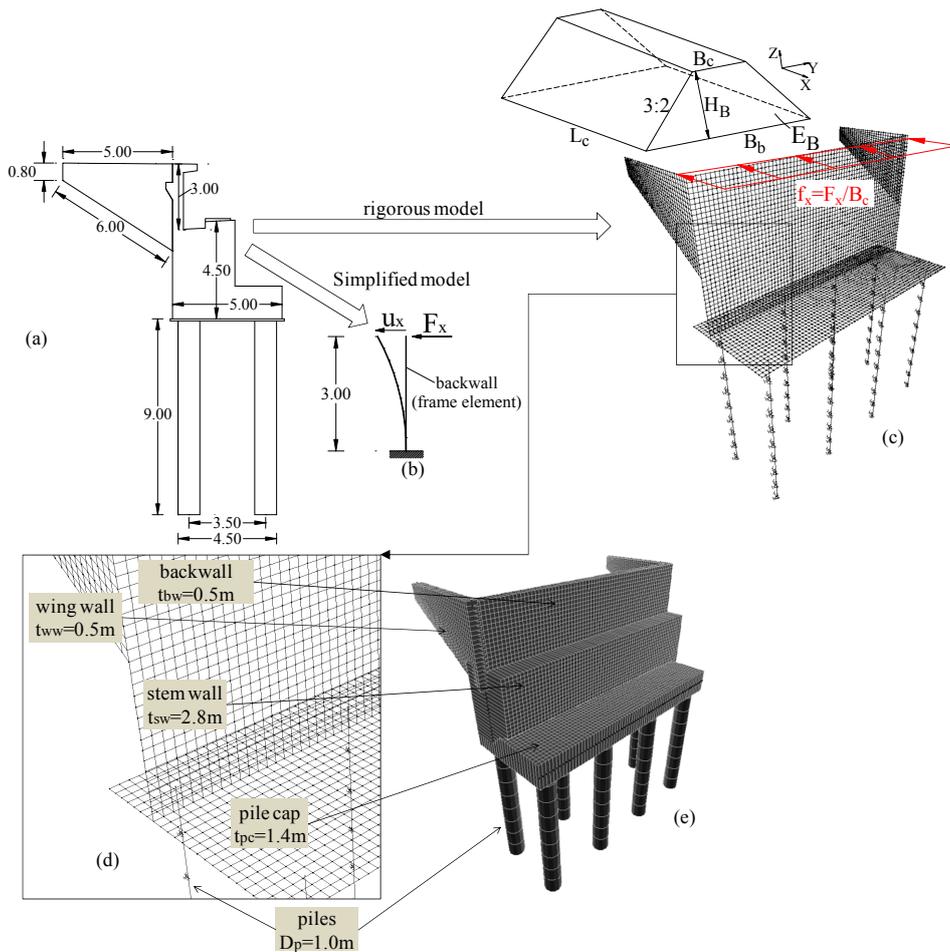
(a) Longitudinal section of the Skarfeia-Raches bridge abutment, (b) the simplified stick model, (c) the rigorous model and the geometry of the mobilized backfill soil, (d) Detail: The thicknesses of the shell elements and the diameter of the piles, (e) Extruded view of the abutment.
